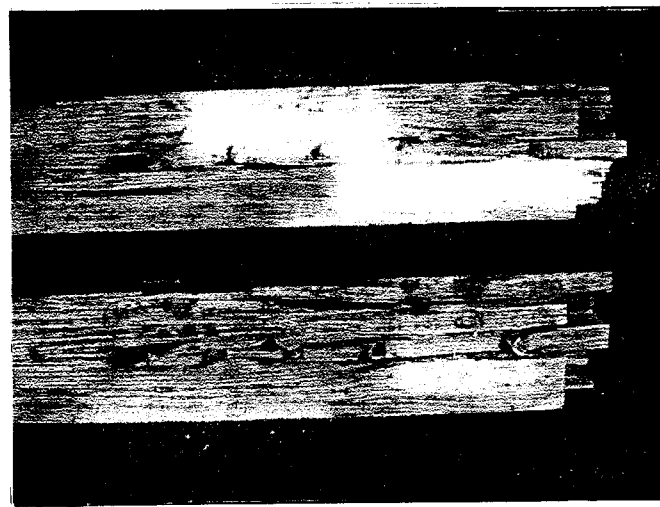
Failure along the reinforcing screws of 1/2" epoxy glued-in lag screw reinforced PSL specimens
